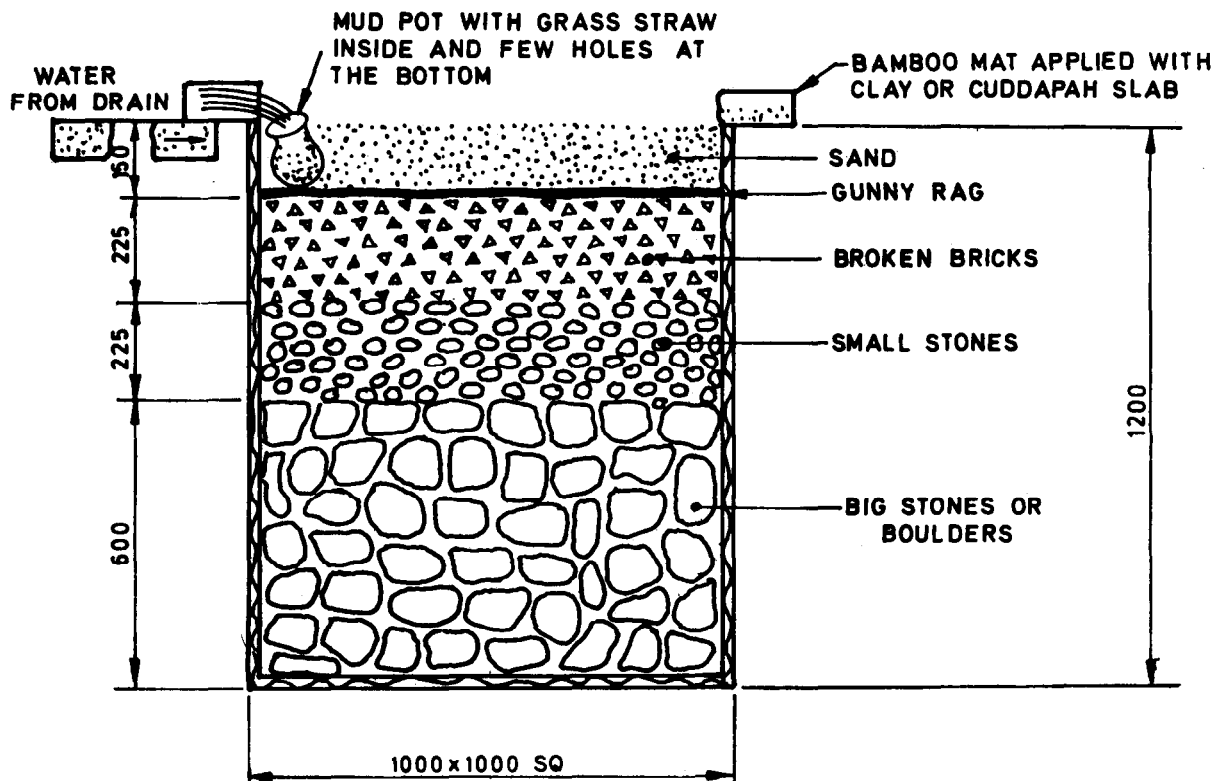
DETAILS OF SOAK PIT FOR DEEPWELL HANDPUMP (VOLM)
